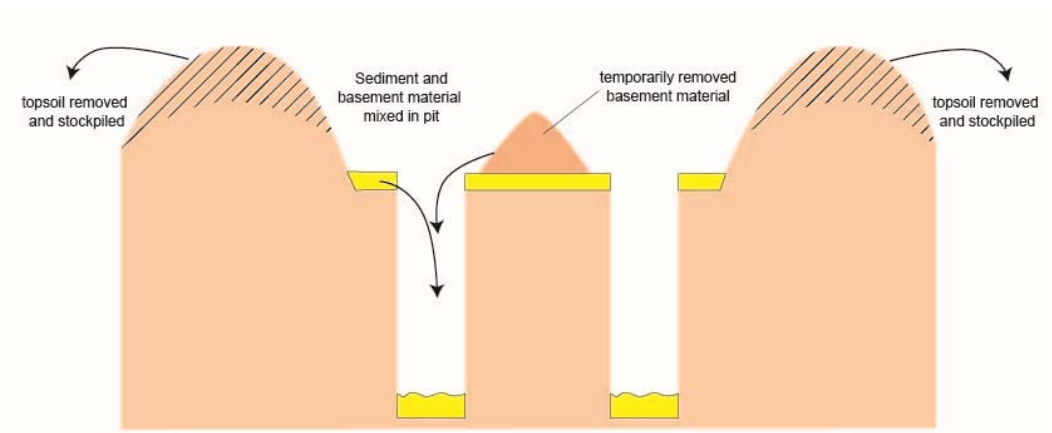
Cross section of the Dawson Dam showing the mix and bury process
